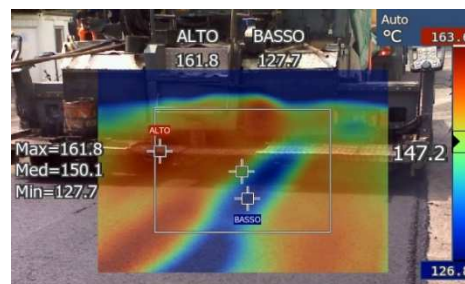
Picture taken with infrared camera showing the paver laying the HMA from plant A hauled with normal truck.
